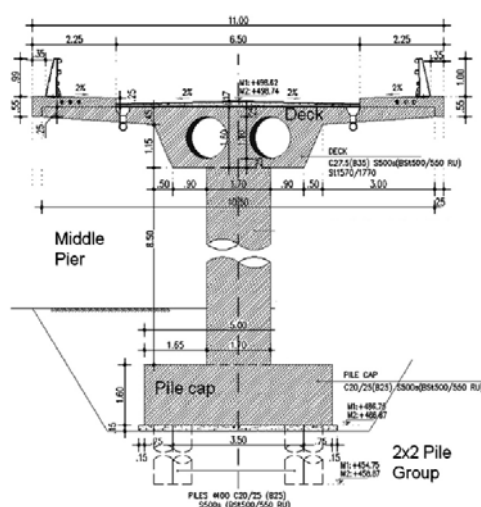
Overview of the foundation-pier-superstructure system cross-section.
